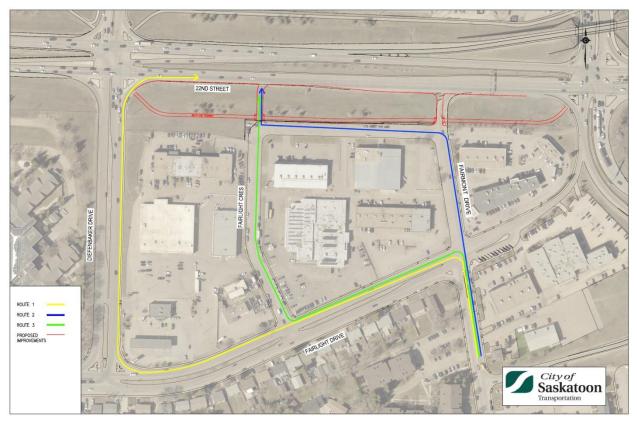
Routes to 22nd Street West with Fairlight Crescent Access
